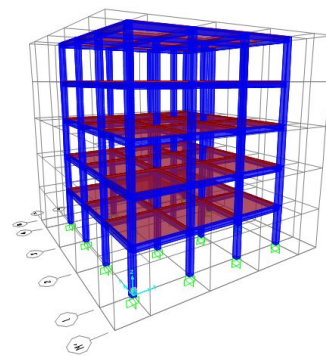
FEM model of Five Storey Building With Fixed Based Condition
